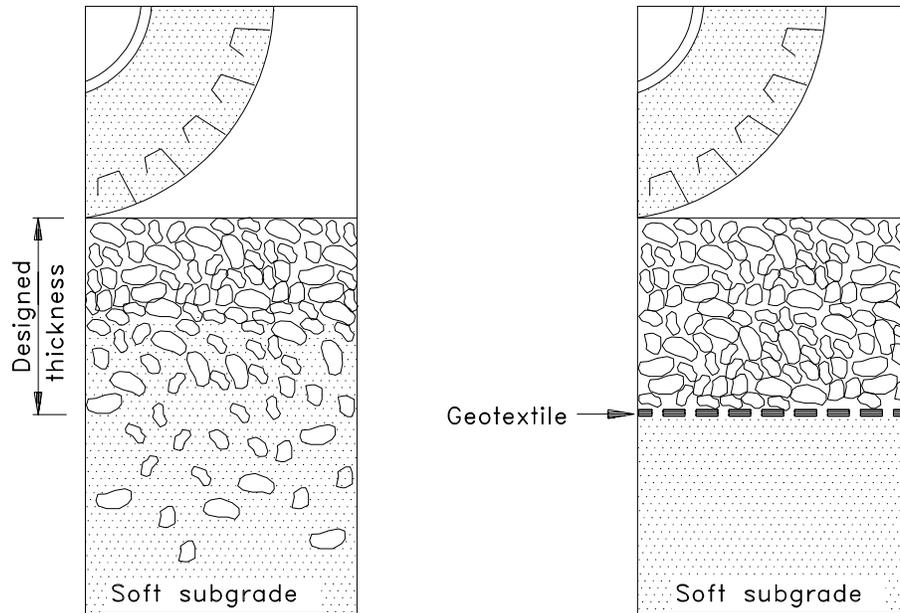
Concept of geotextile separation in roadways (after Rankilor, 1981).
